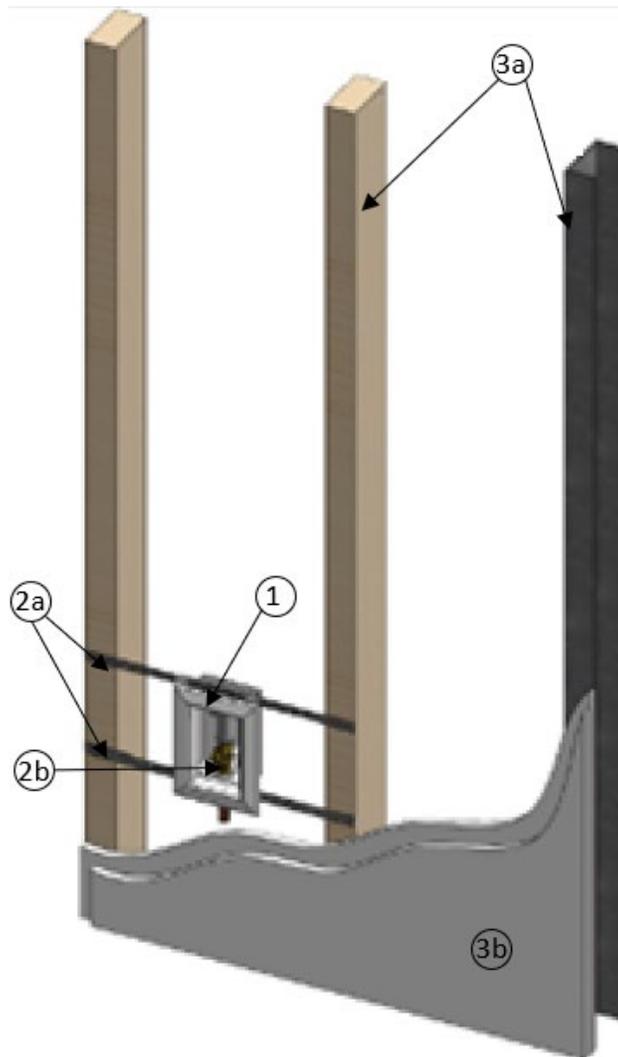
Outlet Box in 2-Hr Fire Rated Walls
